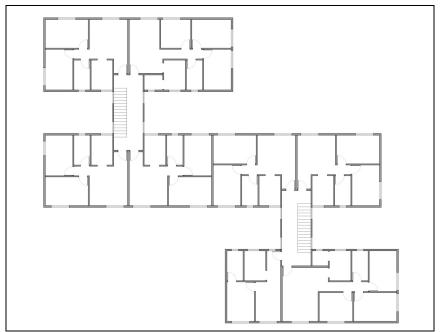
Original floor design – with 1, 2 and 3 rooms
